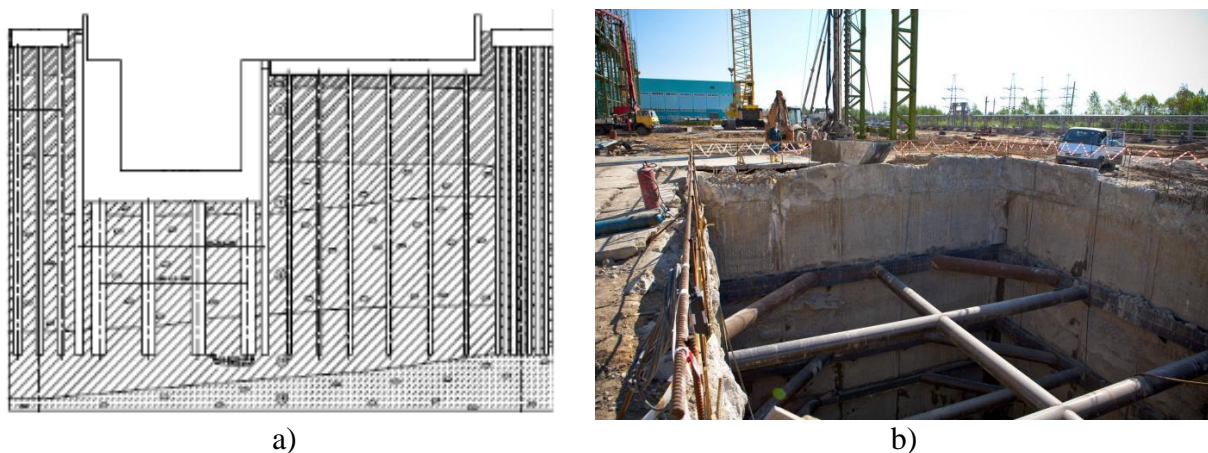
Structural section of the technological pit (a). View of excavated pit in diaphragm wall structures (b). The bracing system of the excavation pit is made in the form of pipes.
